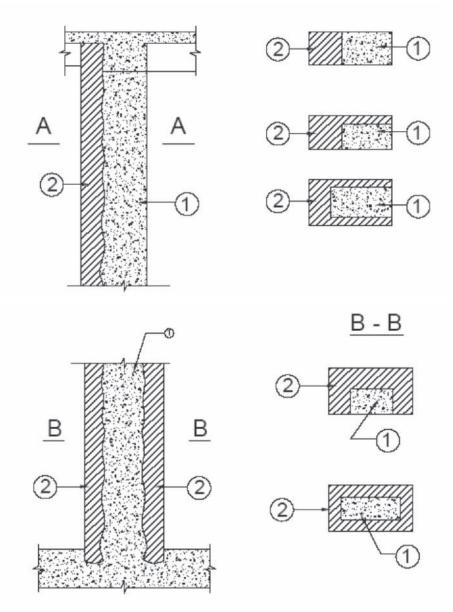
Repair of concrete column by jacketing (1. Existing column; 2. Jacketing concrete)
